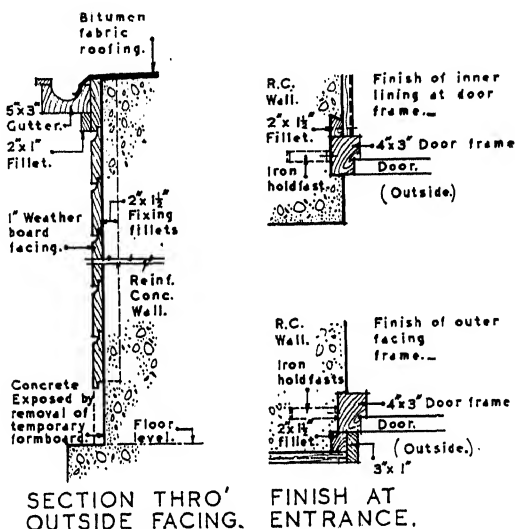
Details of permanent timber formwork for R.C. pill-box shelter.
